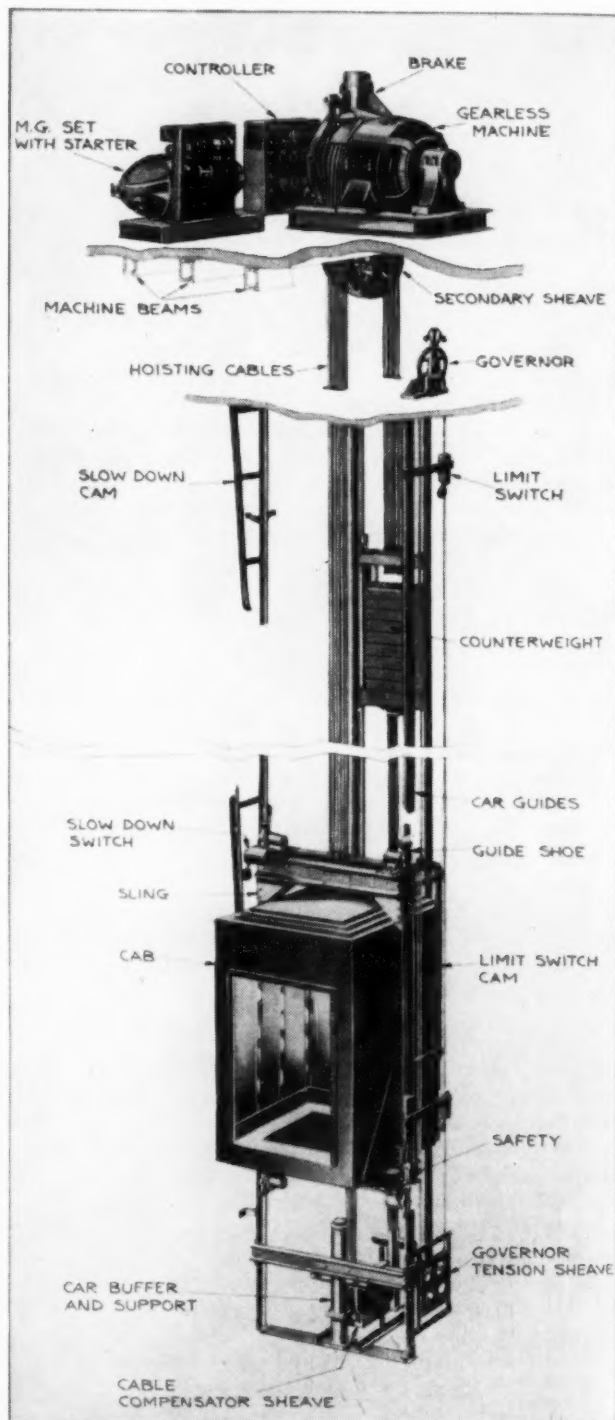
TYPICAL GEARLESS TRACTION PASSENGER ELEVATOR
